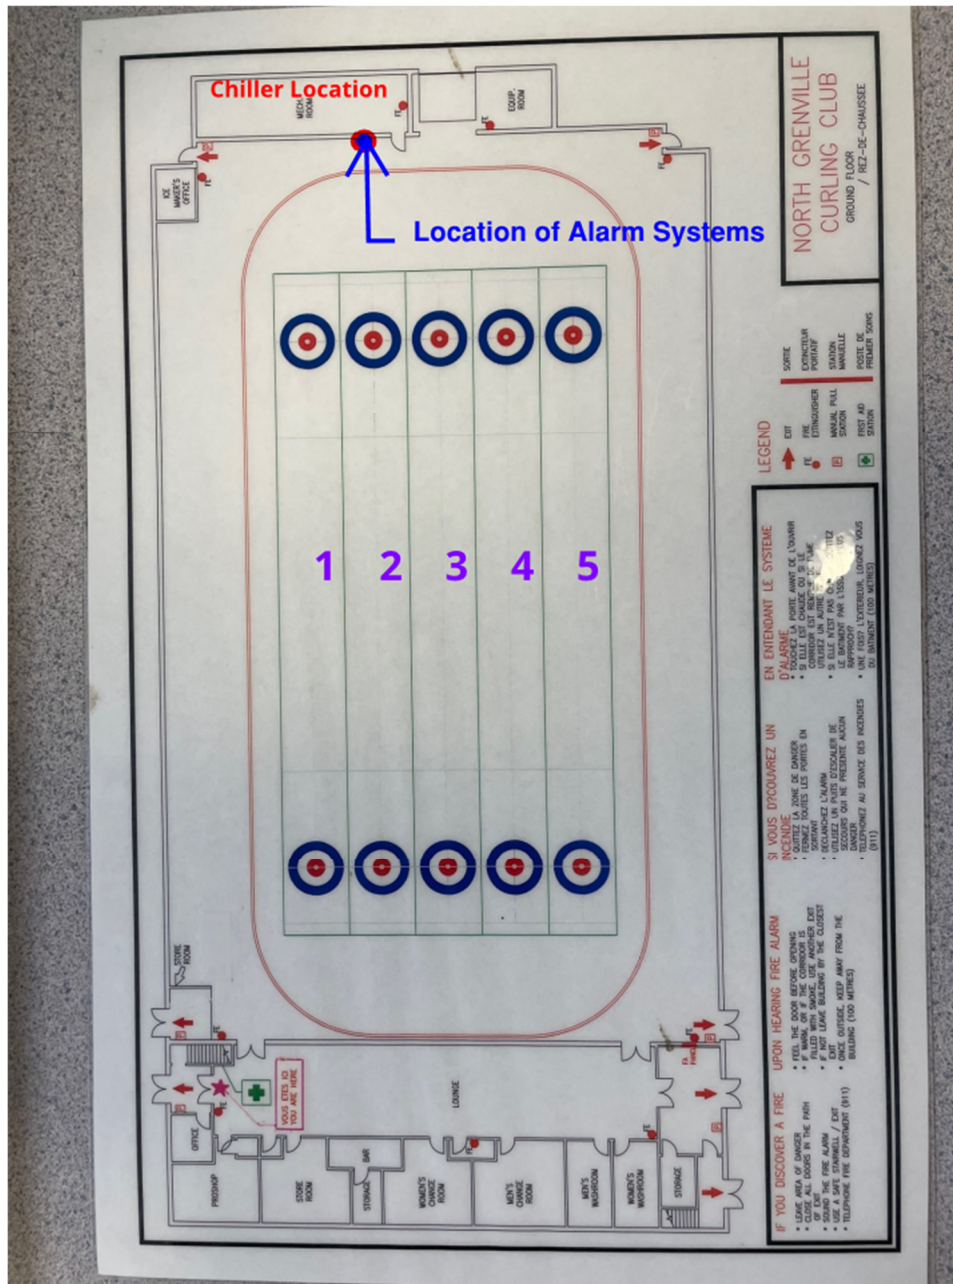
Curling club floor plan with ammonia hazard and alarm location
